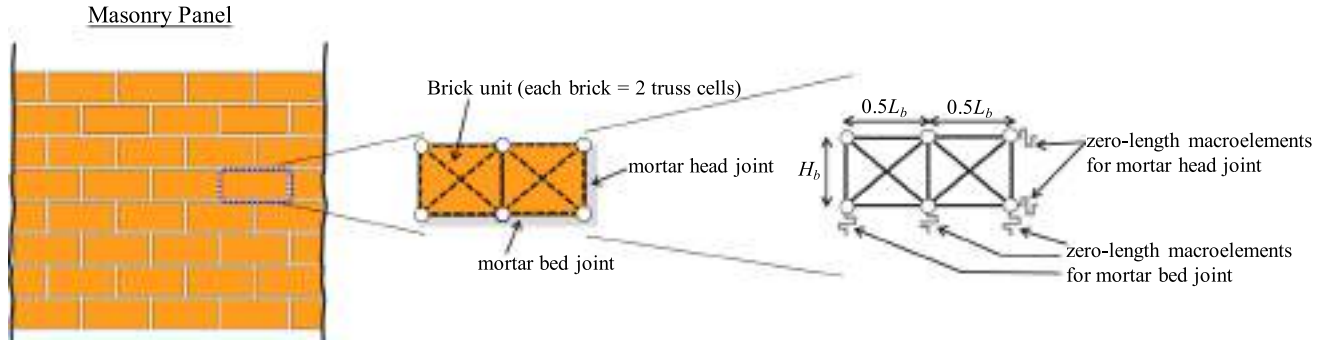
Modeling Approach for Brick Masonry Infill Walls.
